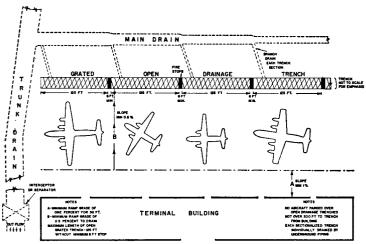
A second possible arrangement of an aircraft fueling ramp drainage system using a grated open drainage trench.
